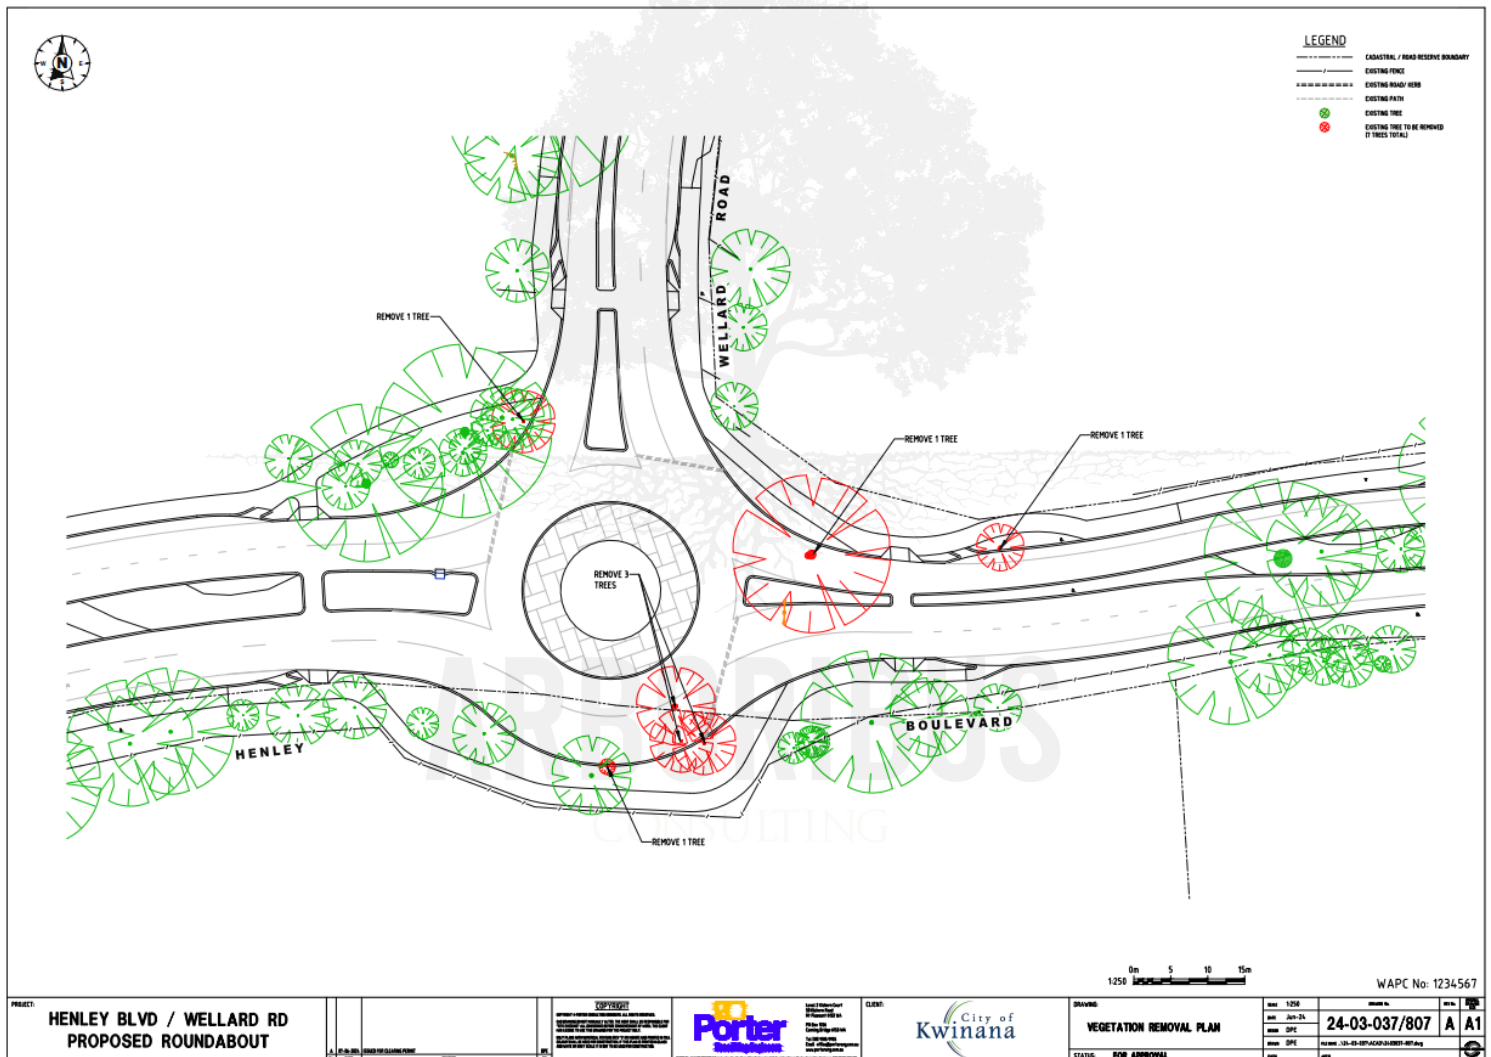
Proposed Round-a-Bout construction at Henley Blvd & Wellard Rd - Porter Engineering Drawing 'Vegetation Removal Plan' No. 24-03-037/807A
